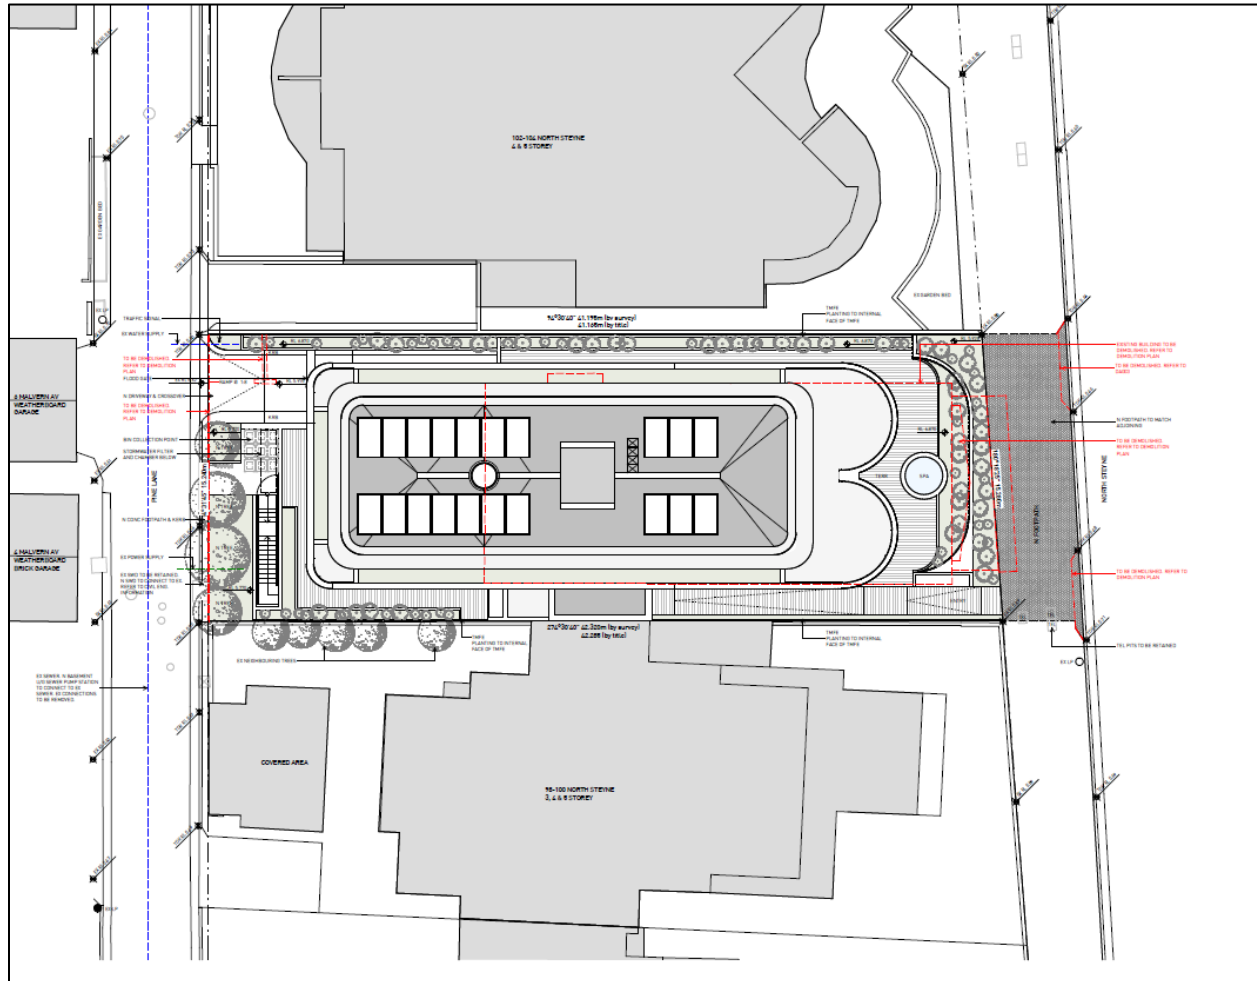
Site Plan (Source: Smart Design Studio, 2024)
